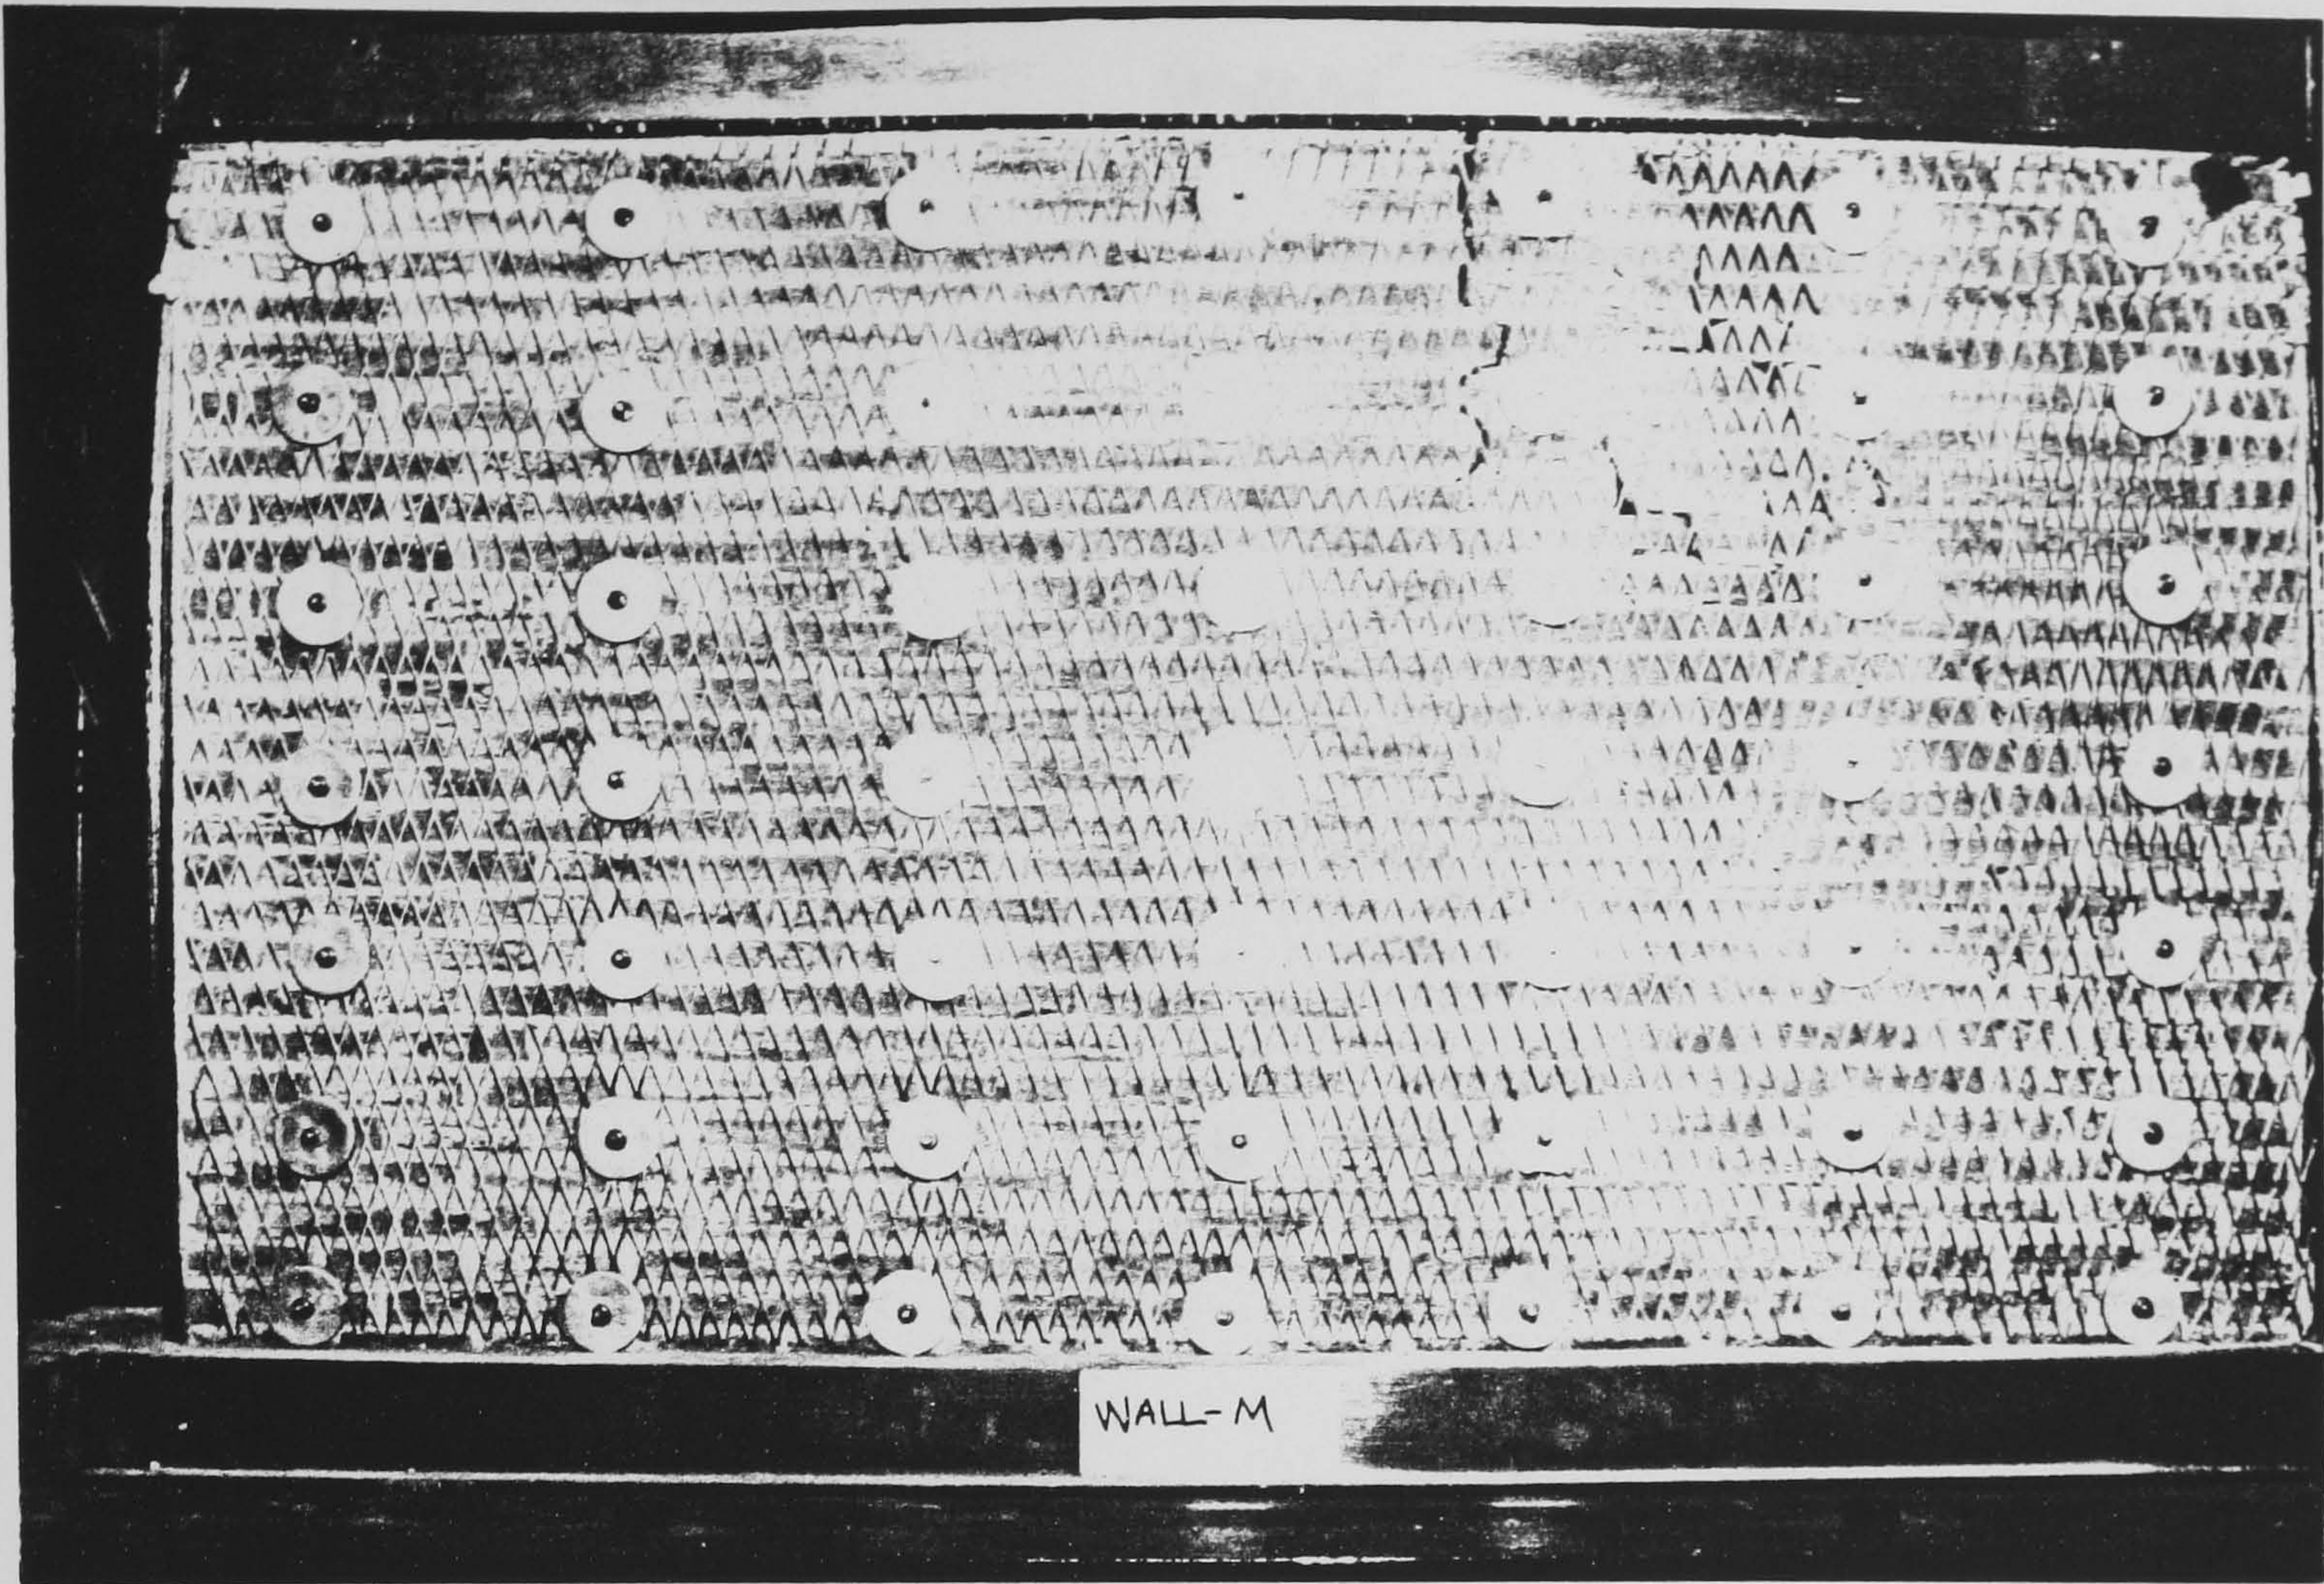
Mesh side after appearance of crack 2 (wall-M)
